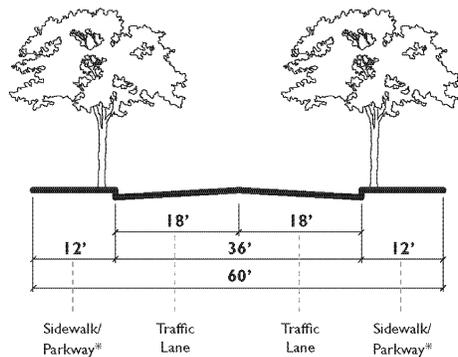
(1 of 2): CITY OF CHINO HILLS GENERAL PLAN ROADWAY CROSS-SECTIONS
